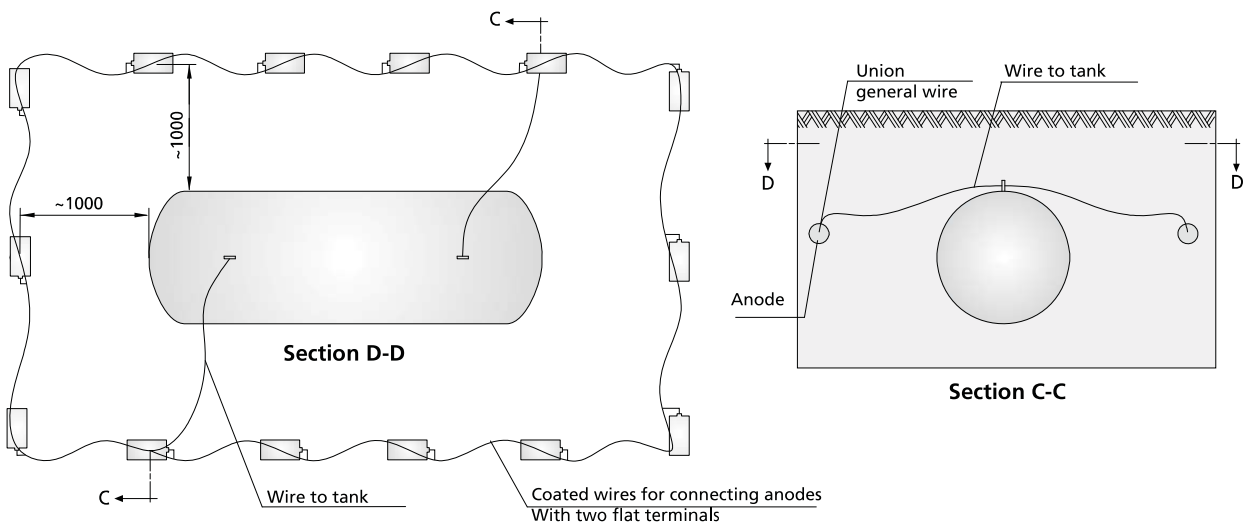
DETAIL OF INSTALLATION\* OF ANODES IN UNDERGROUND TANKS
